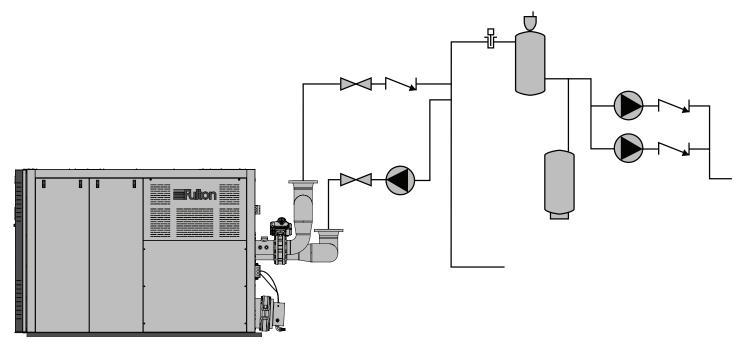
SAMPLE PIPING LAYOUT, PRIMARY - SECONDARY PIPING; SINGLE BOILER
